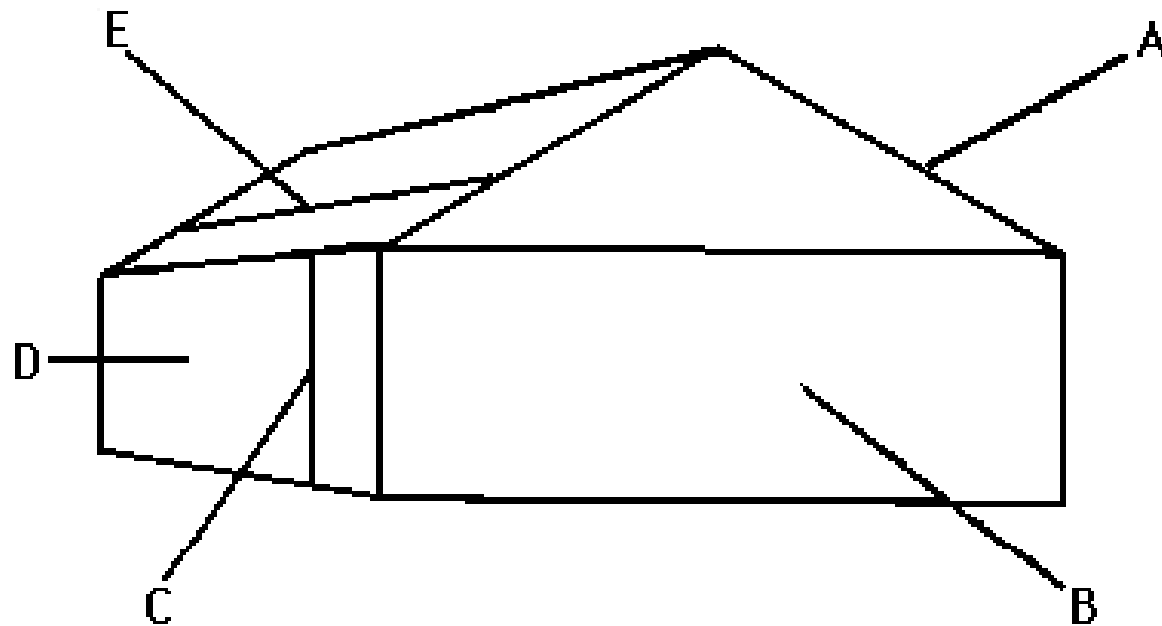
Basic structural components of a greenhouse: A)rafter, B) end wall, C) side post, D)side wall, E) purlin.
